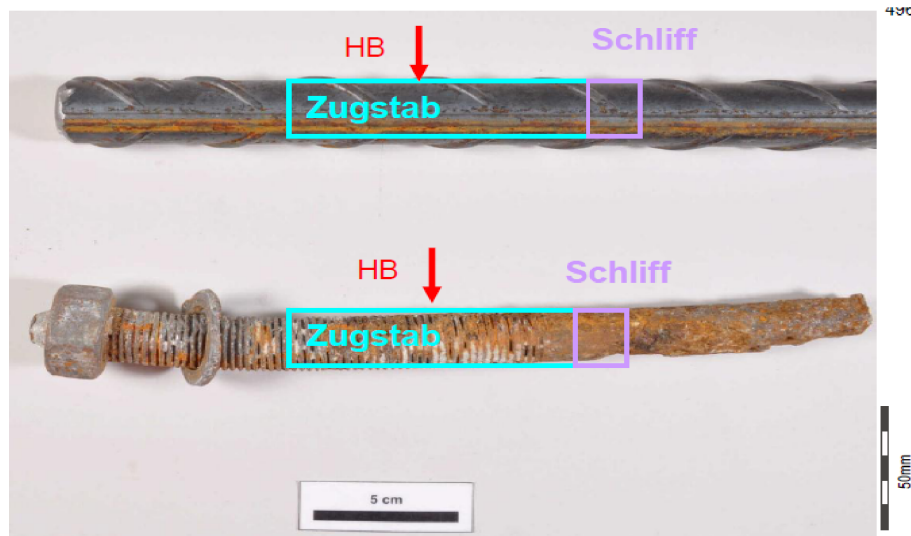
Details of sampling for new and old steel anchor; [39]
